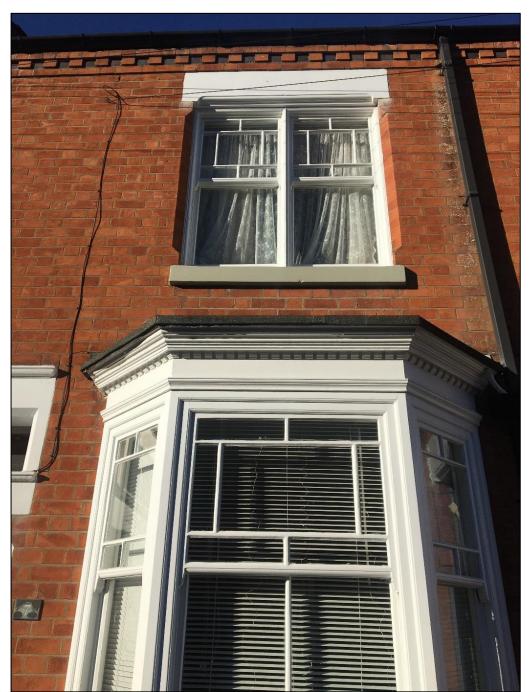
The original joinery to the front of the house at number 7 St Dunstan's Road.
